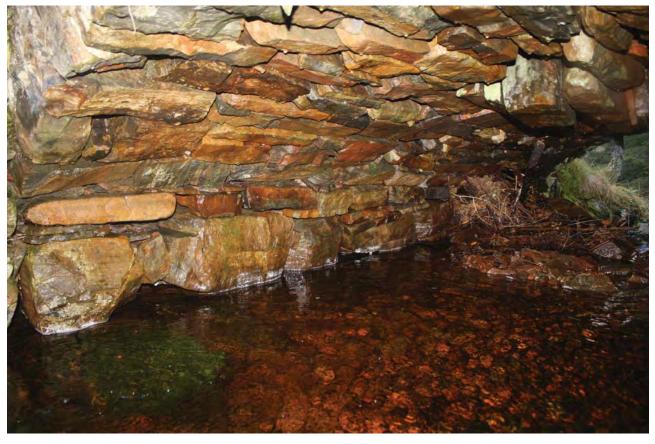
Bridge 007, general view of the underside of the bridge to the north side, from the north-west
